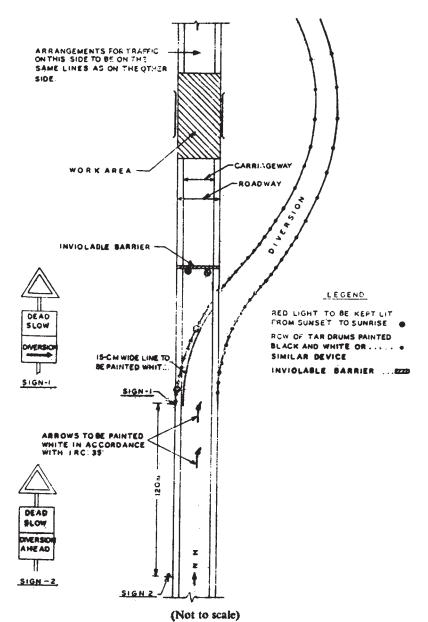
Arrangements during reconstruction of cross drainage structures where traffic is to be passed over a diversion
